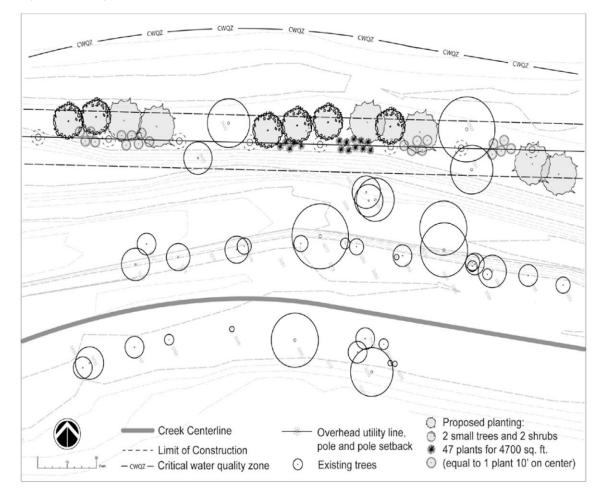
S.5-1: Example of Rooted Plant Layout and Calculation
